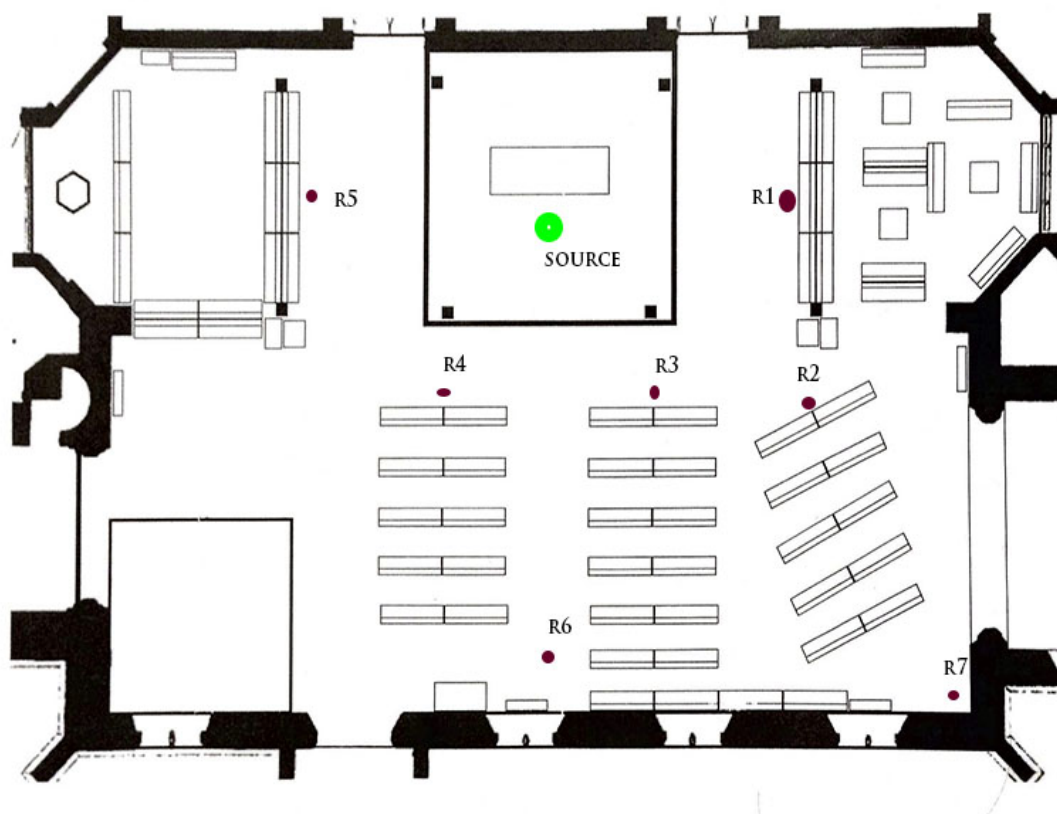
Floor plan of the Central hall with source and receiver positions.
